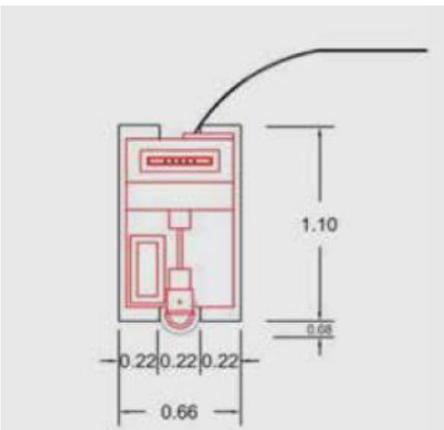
Floorplan dimensions of the crawler with pile driving column or drilling rig in working position. ©GENOVATEK
